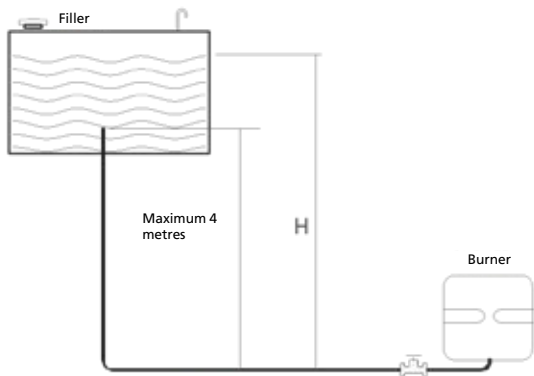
Burner oil pump details 40 - 175 gravity feed from the bottom of the tank
